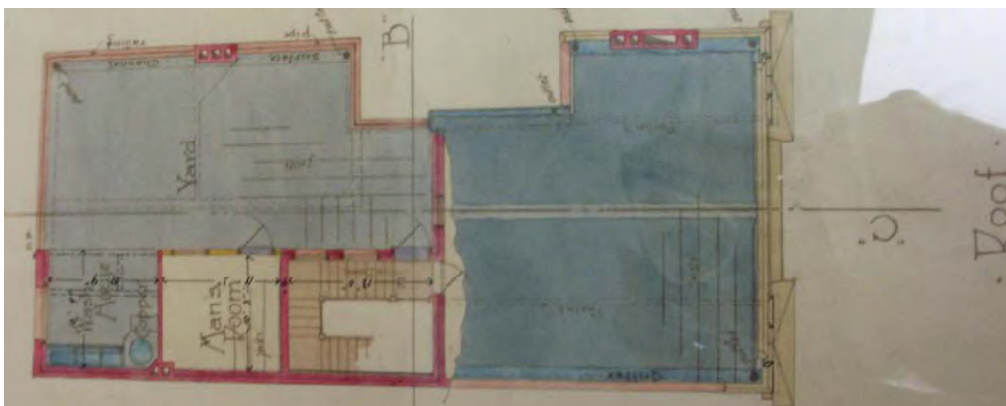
Roof plan showing the roof top wash house and “mans room”, which may have accommodated the Hotel manager or caretaker.
